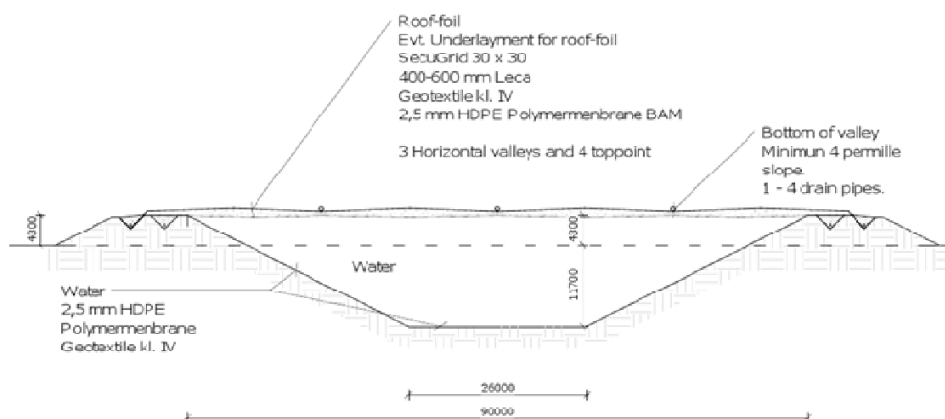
Construction cross section of the 75,000 m³ PTES in Marstal. (Source: PlanEnergi)
